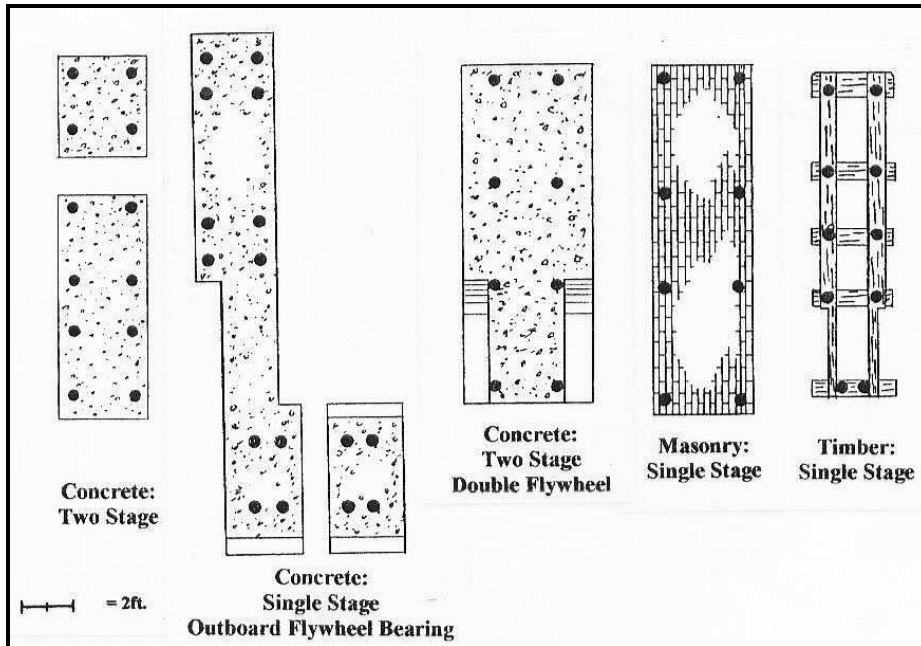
The plan view depicts foundations for straight-line compressors. Source: Eric Twitty.
